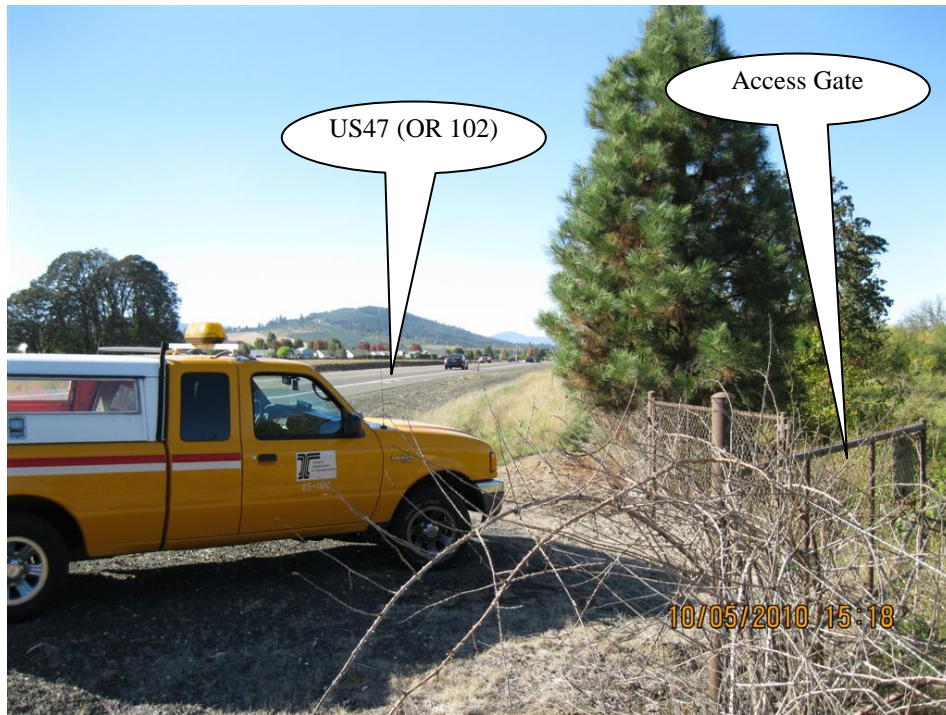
Looking towards the northwest at the access gate, leading to water quality facility.
